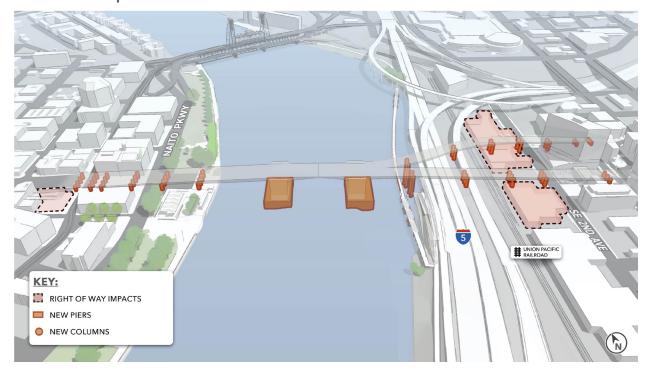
Couch Extension Alternative – East Approach from Southern Viewpoint
